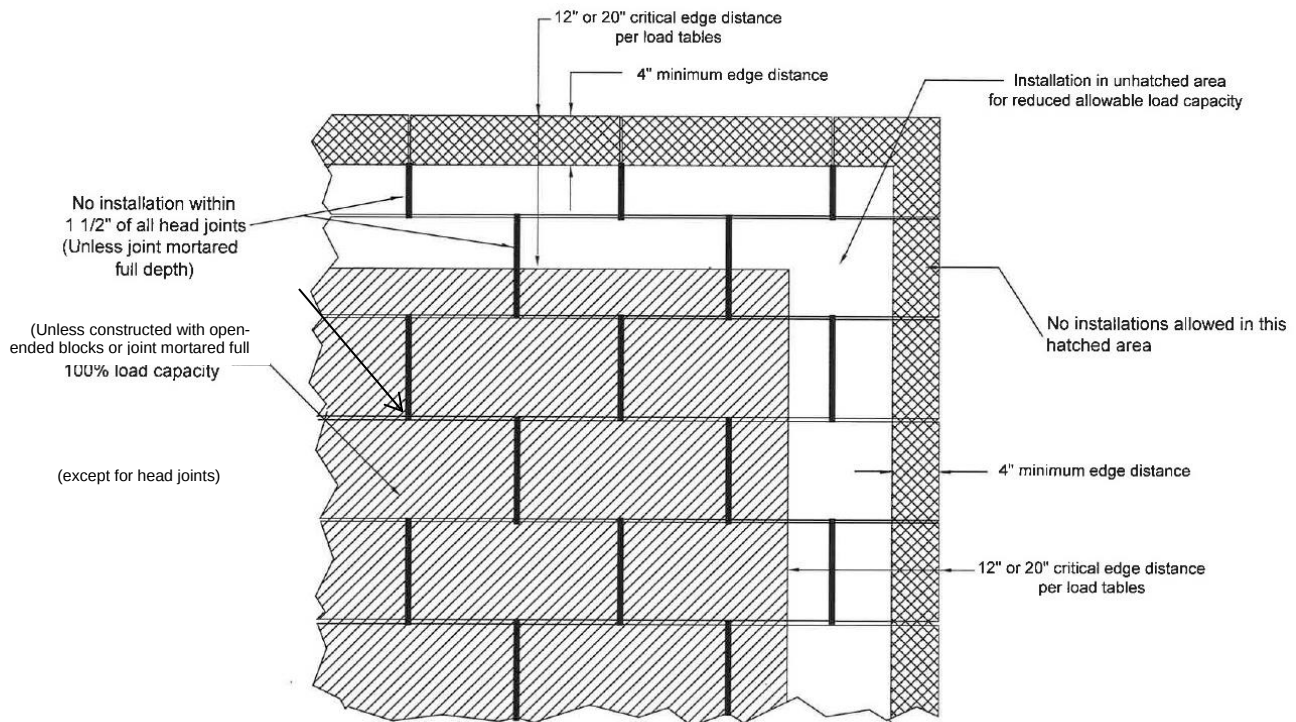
ILLUSTRATION OF PERMISSABLE LOCATIONS FOR RED HEAD A7+ ADHESIVE ANCHORS INSTALLED INTO THE FACE OF GROUTED CONCRETE MASONRY WALL (ELEVATION VIEW)
